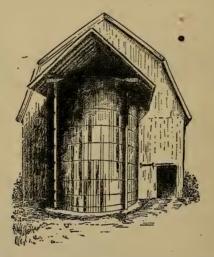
A cheap roof of a stave silo. (Clinton.)
